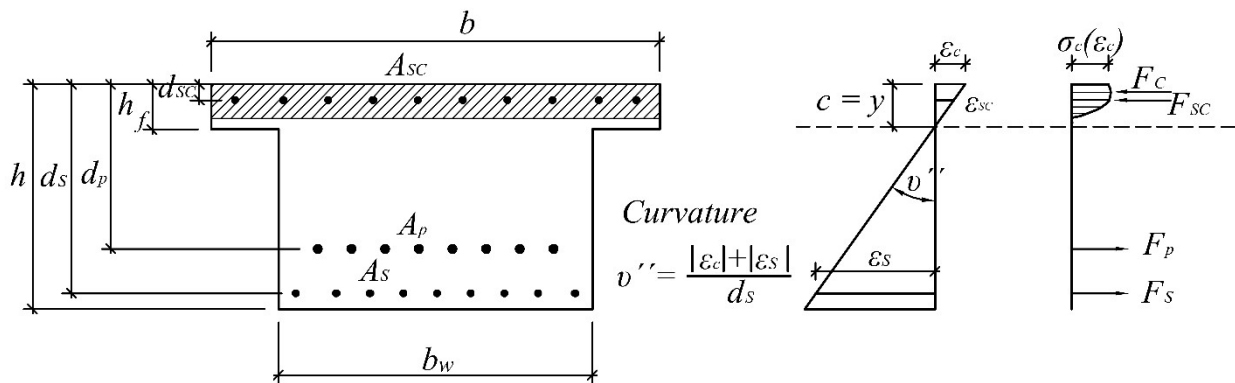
Stresses, strains and internal forces of a fully cracked section.
